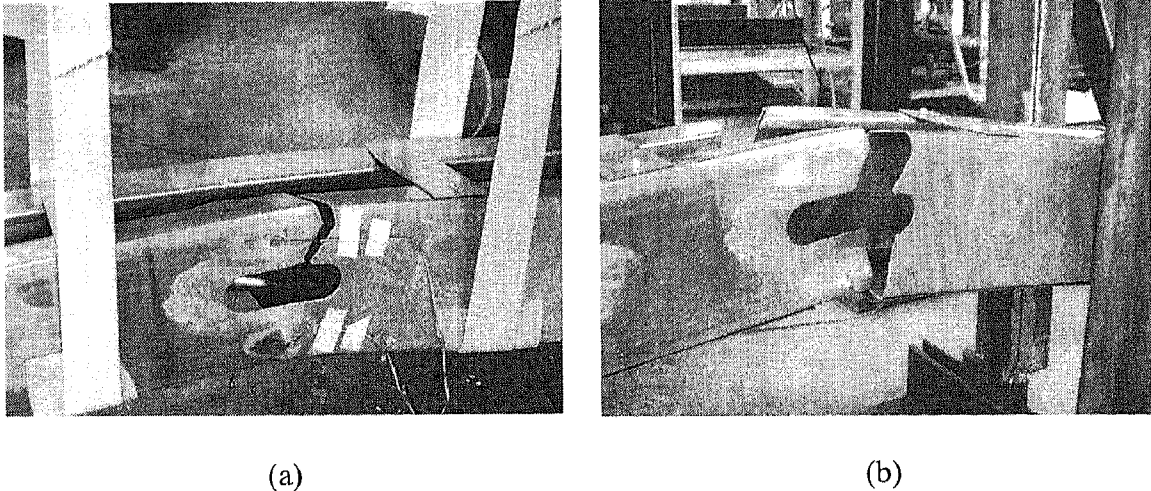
Shiny Stud Failure (a) Initial Crack (b) Cross-sectional Failure
